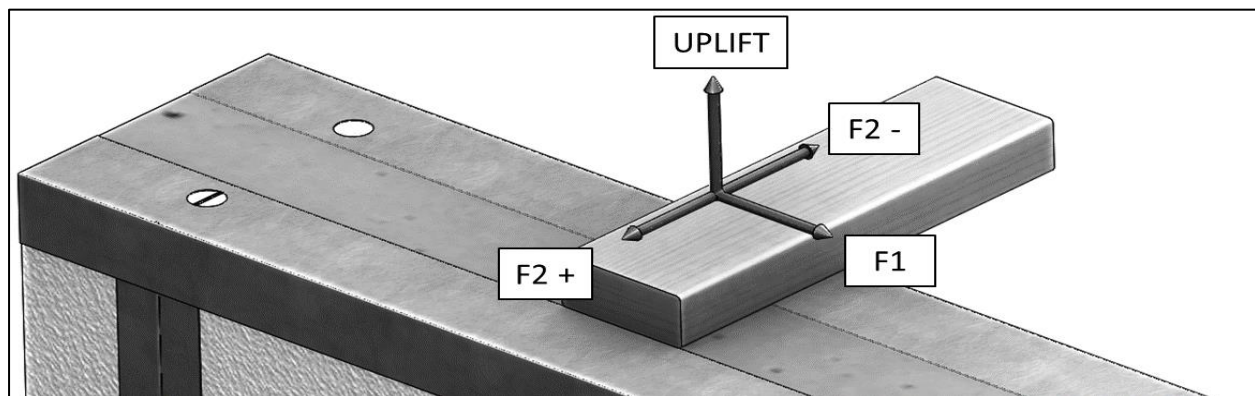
Load Diagram for Truss Saddle Bracket and Embed Connection
